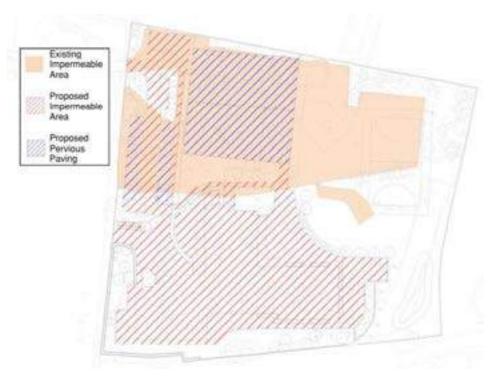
Llanilltud Faerdref existing impermeable/permeable areas
